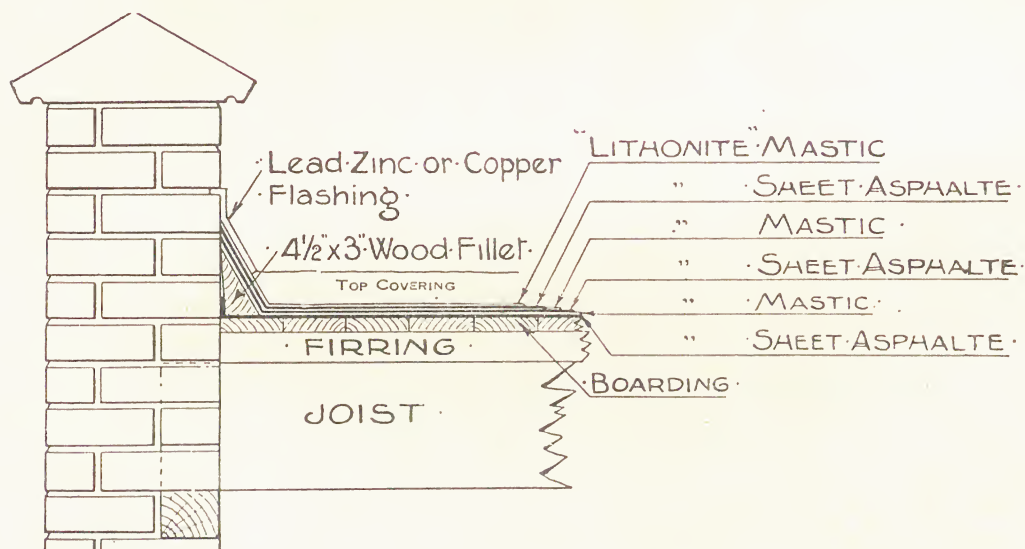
“Lithonite” roofing, boarded flat, showing parapet.
